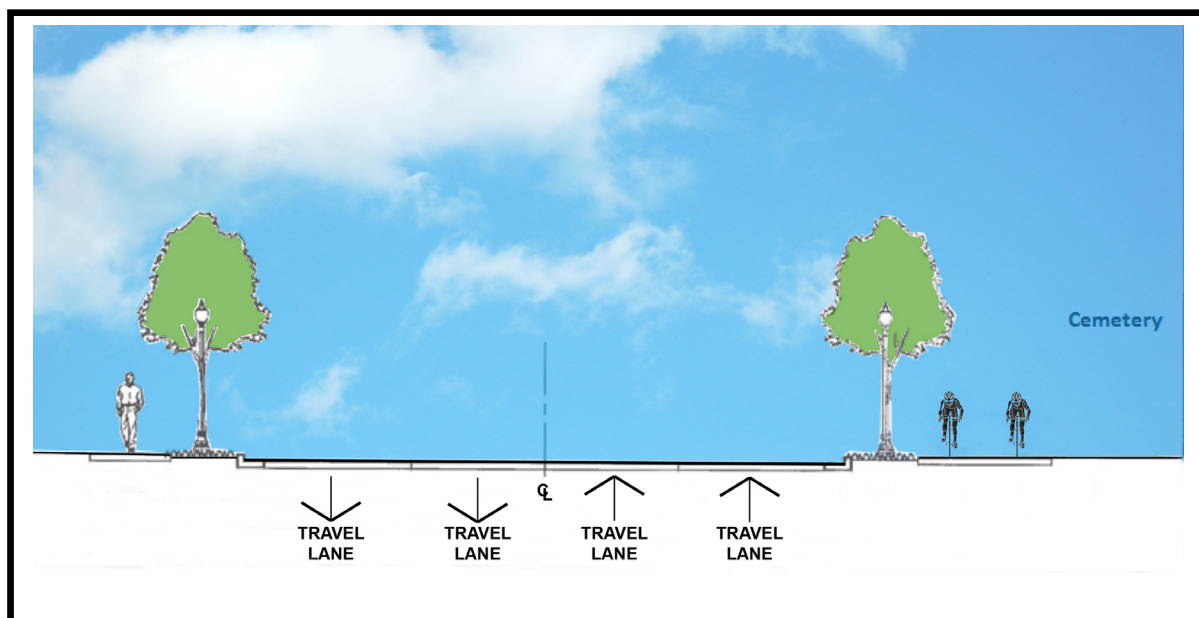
Conceptual Columbia Pike Cross-Section (subject to change).
